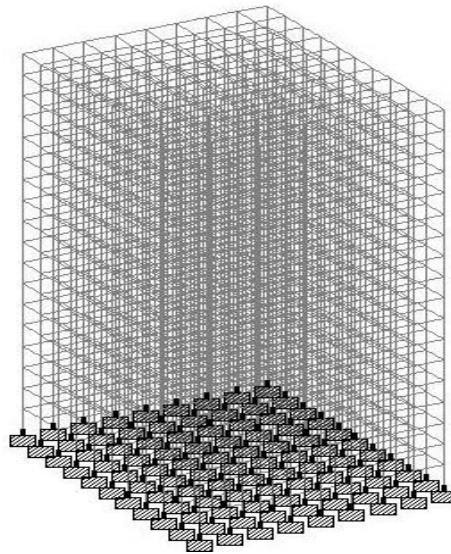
Dimension Plan Diagram of Rectangular Building with Diagrid and shear wall at center
